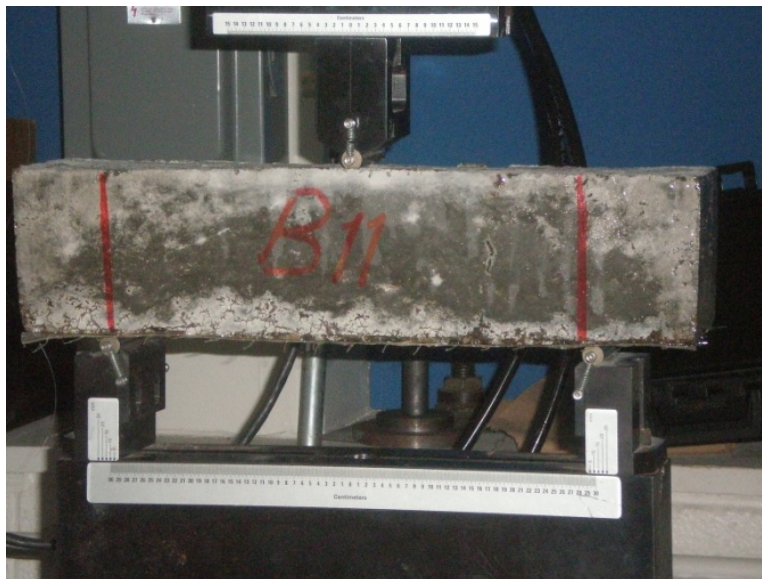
Beam specimen B11 strengthened by Sika GFRP
